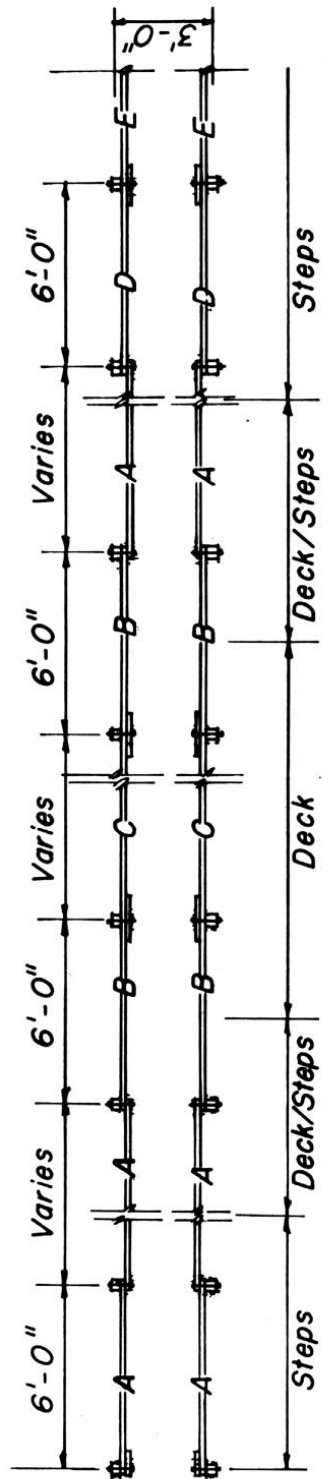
TYPICAL SECTION scale: 1"=1'-0"
